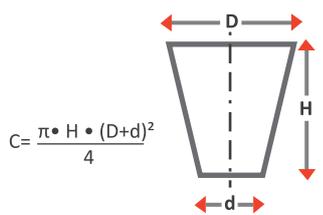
RESIN CONTENT AND CONE DIMENSIONS
